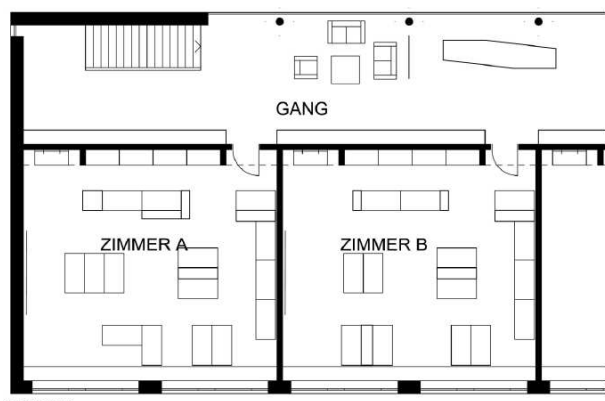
Part of the first floor plan of the school in Birnenstorf: Two classrooms (Room A and Room B) with the corridor and stairway. In the corridor the children can also work. The doors to the classrooms remain open.
